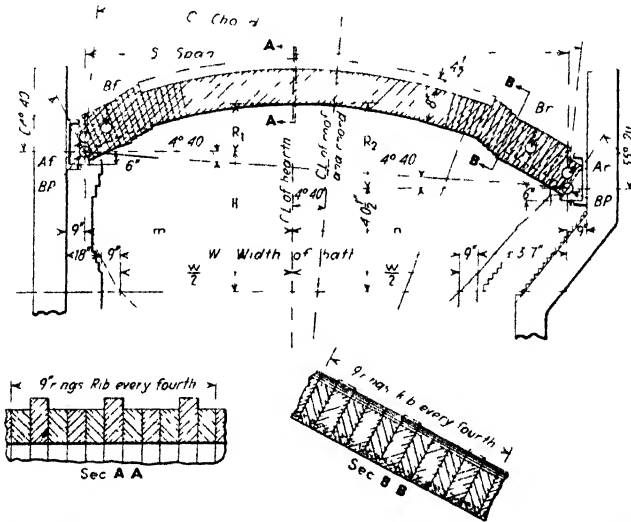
Basic open-hearth furnace roof (From W. C. Buell, Jr., *Improving Open Hearth Furnace Design*, Steel, Jan. 23, 1933)
